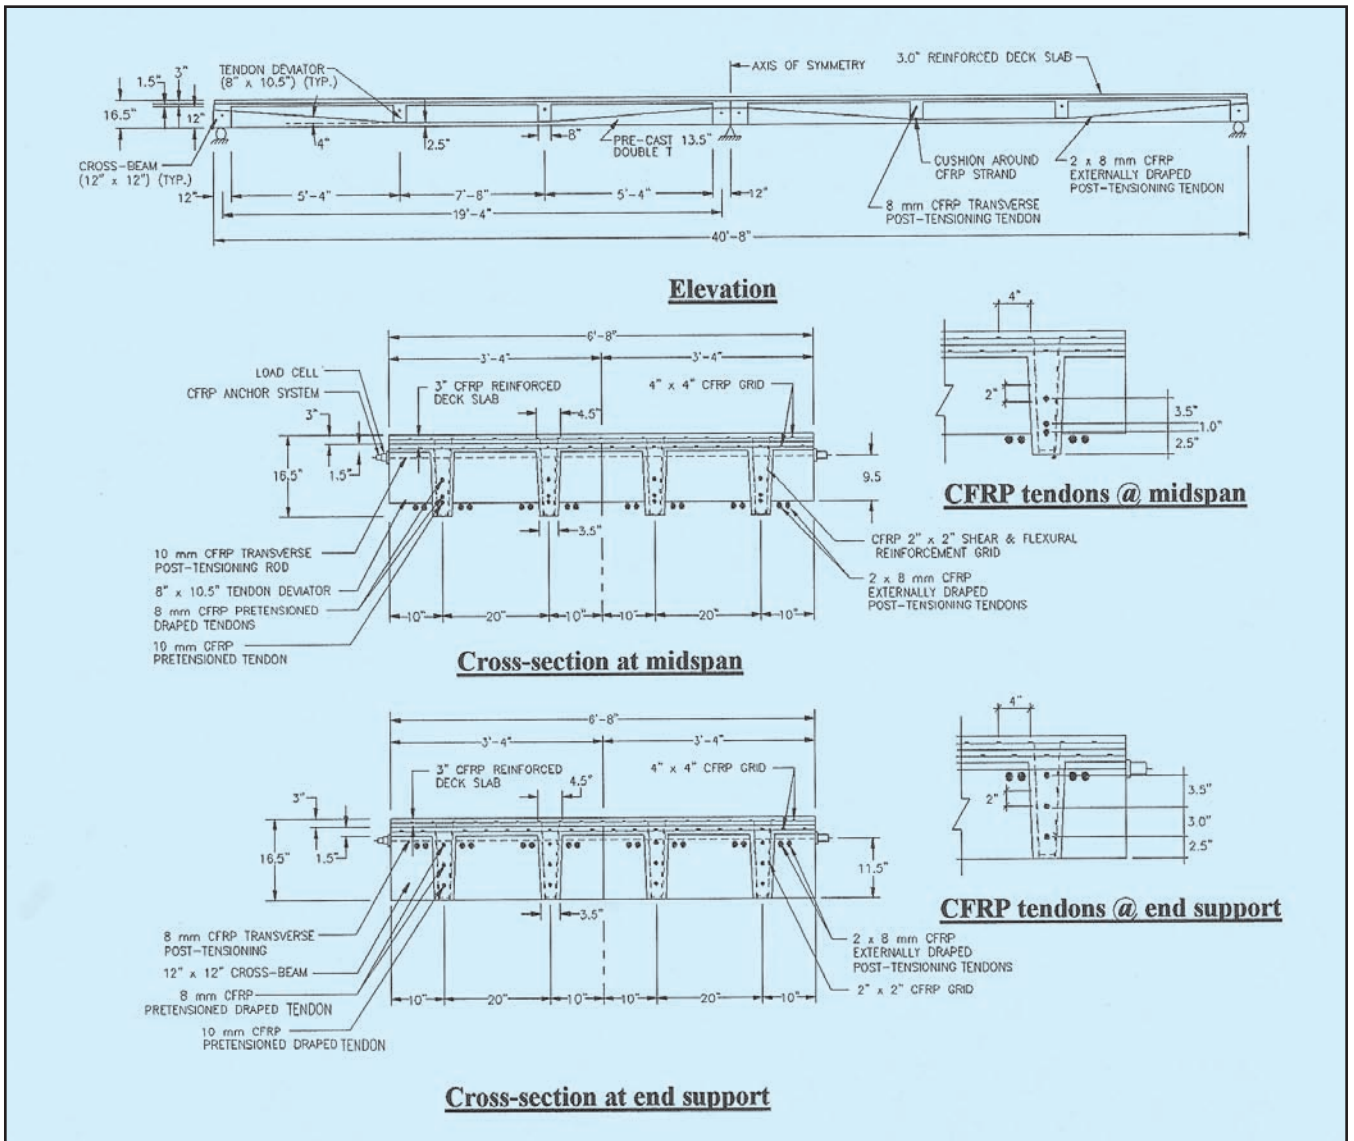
Details of Bridge Model CDT1, prestressed using CFRP Leadline tendons and reinforced with NEFMAC grids.
